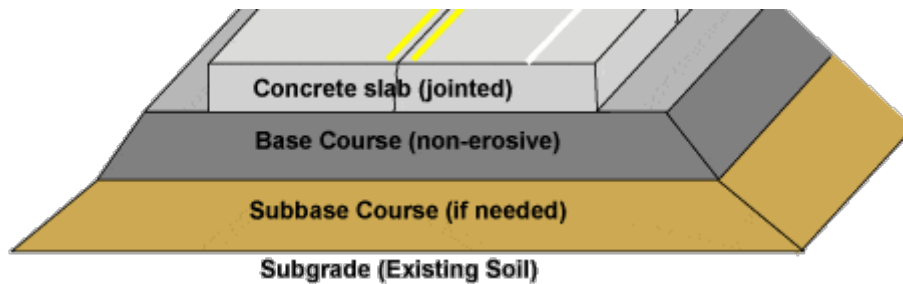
Rigid pavement cross-section (The Constructor, 2020)
